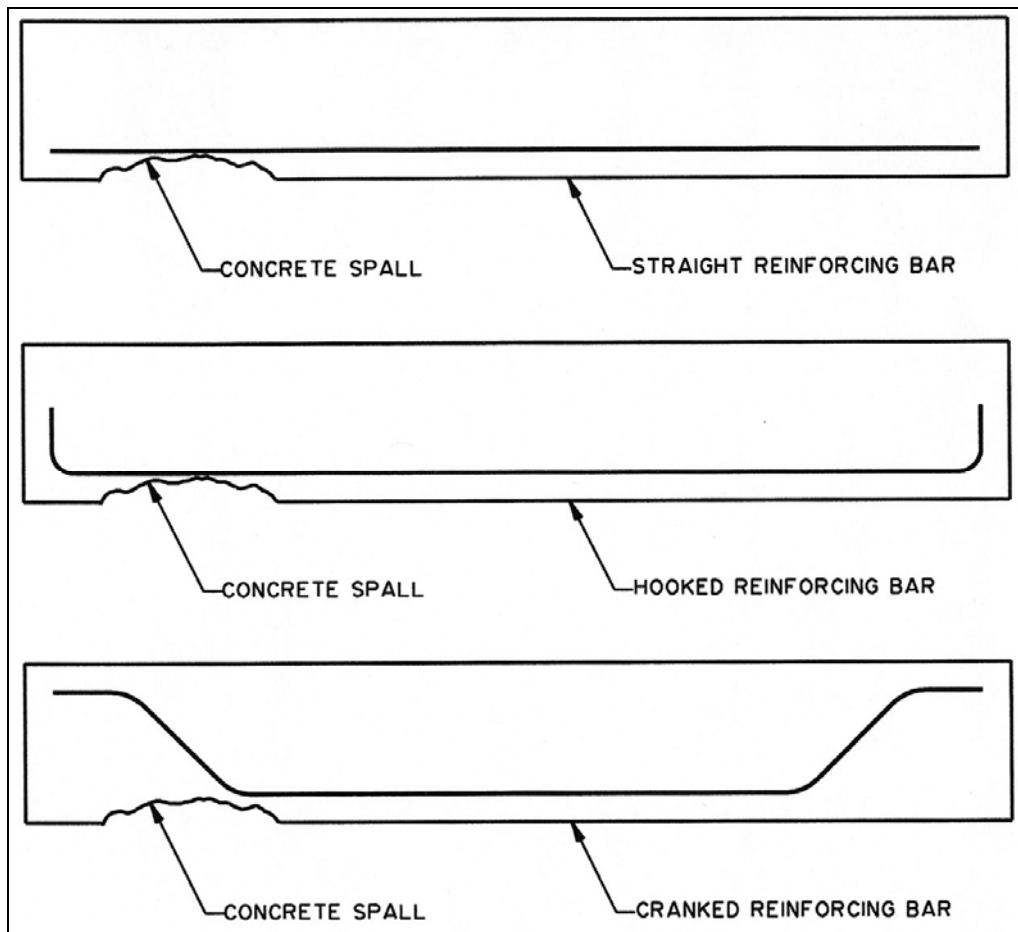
Standard Channel Girder–Straight, Hook and Cranked Longitudinal Bars
